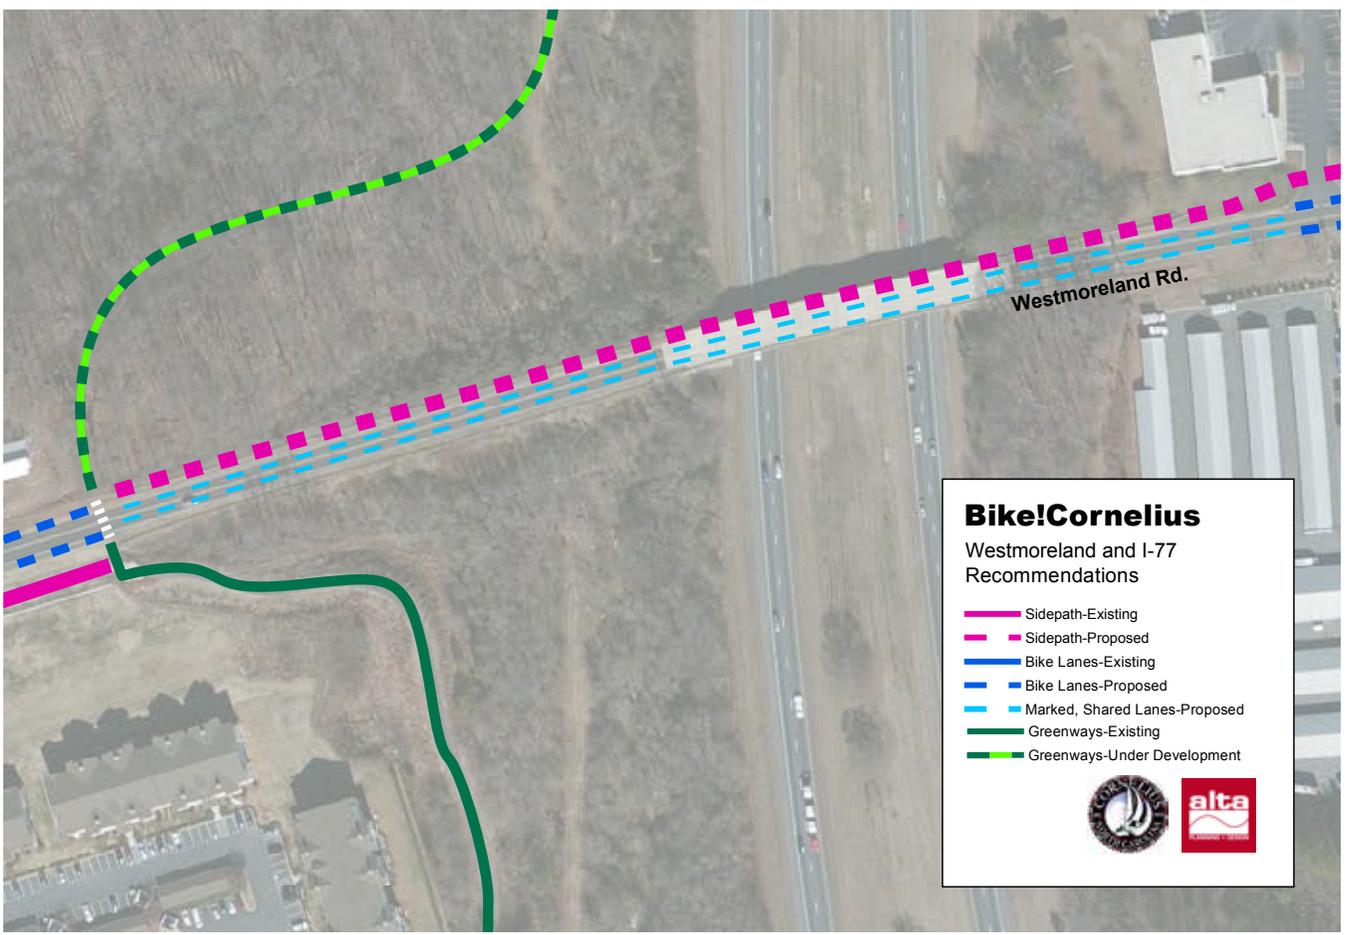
Existing View and Proposed Schematic Plan View of Westmoreland bridge Reconfiguration and Sidepath
